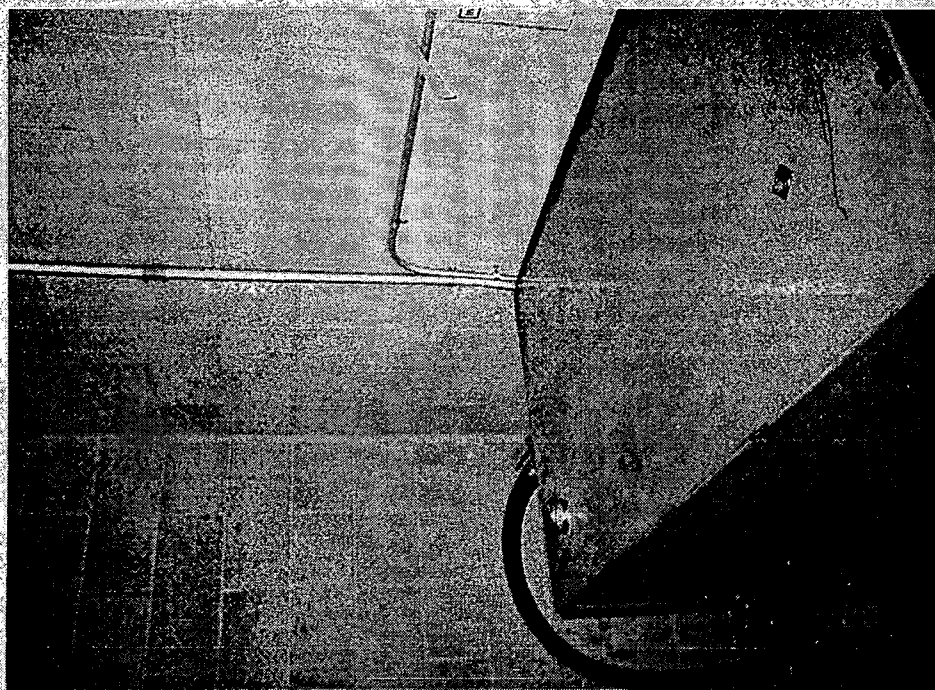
Hydraulic elevator operating equipment in the lower level, note no floor staining.
